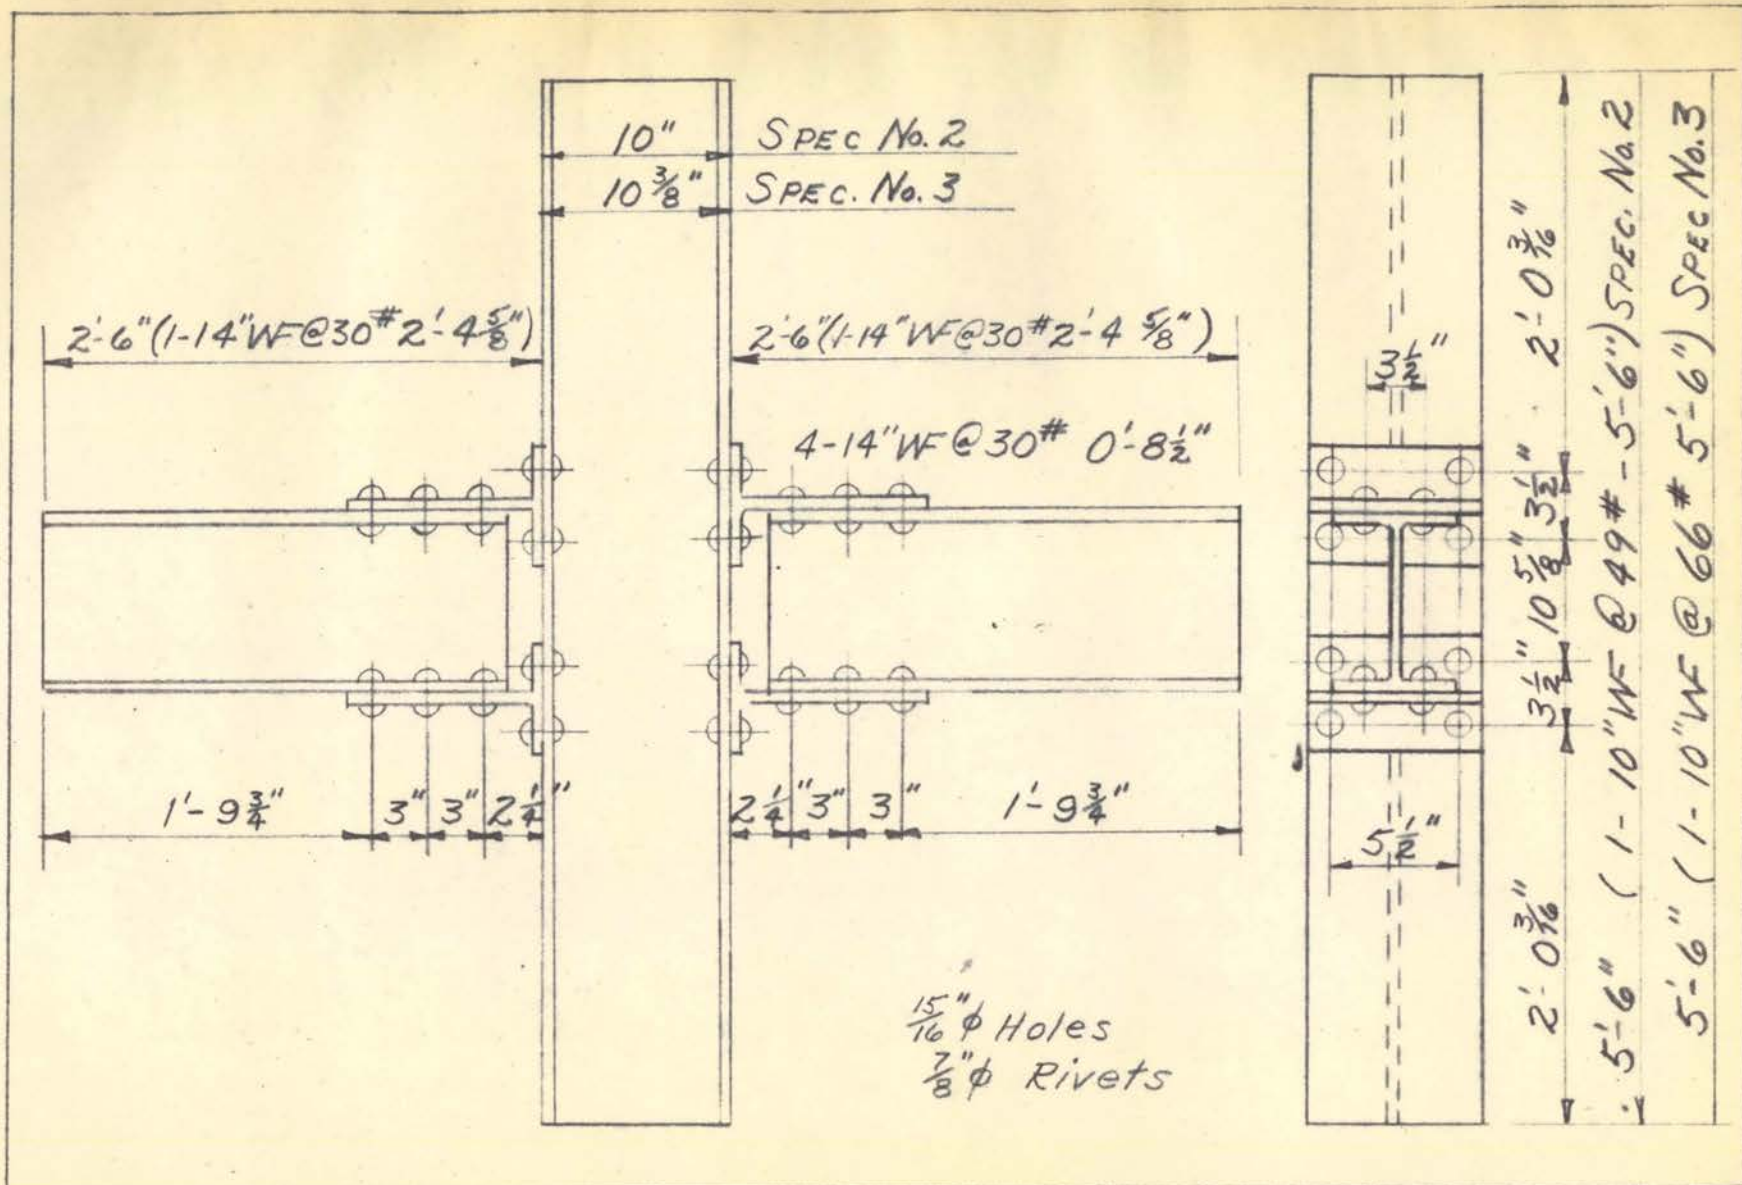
DETAILS FOR TEST SPECIMENS 2 & 3.
